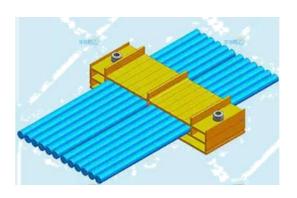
Screw lock with wire fixing device (for reference only)
